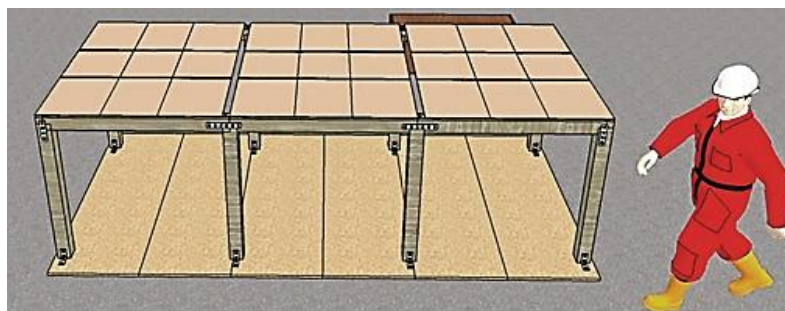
A 3-D sketch of the wide corridor model with ceiling
